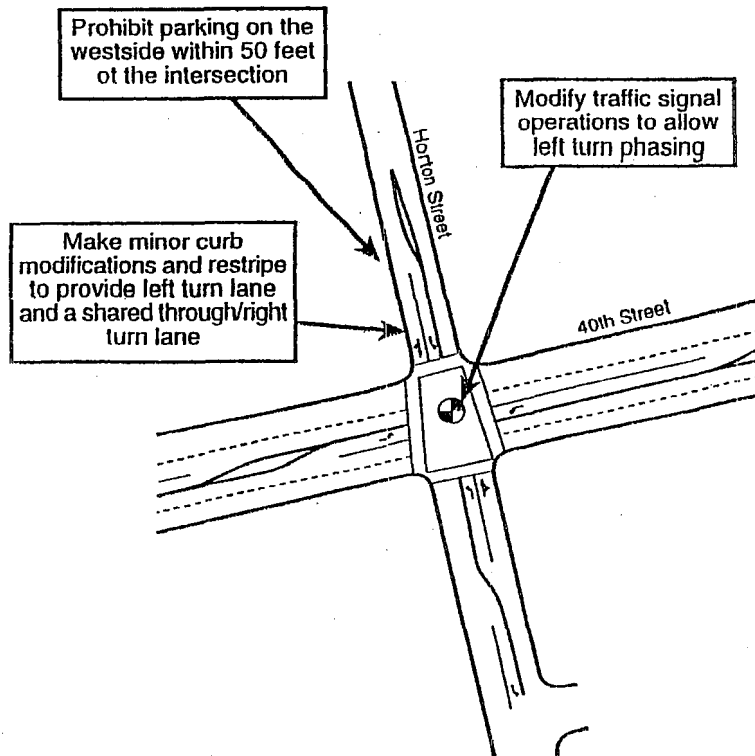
40TH STREET AND HORTON STREET INTERSECTION MODIFICATIONS
